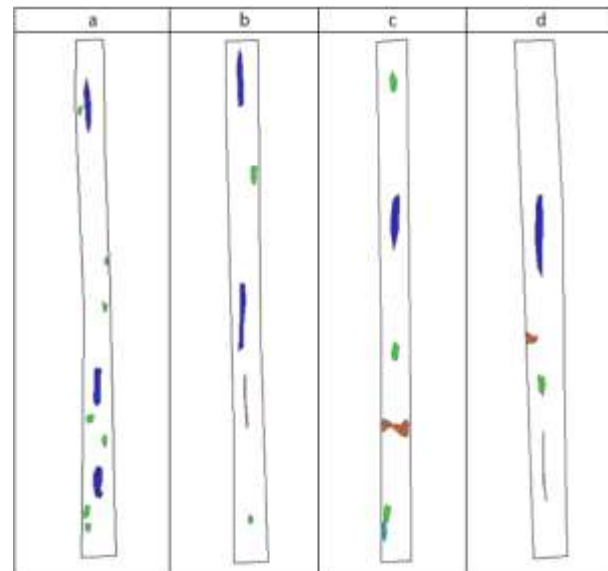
Segmented pavement distresses in section 2, Shaheed Minar to Old Administration Building
